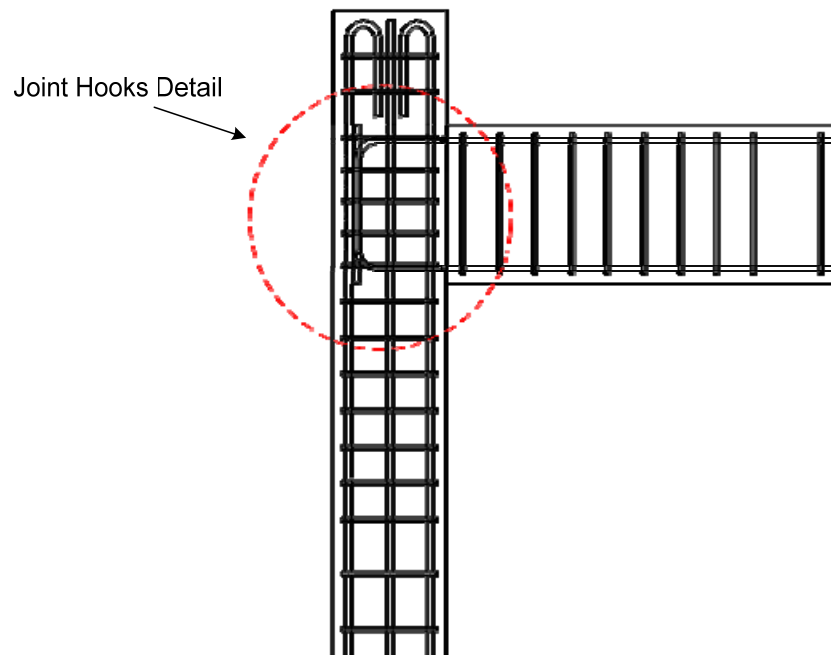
Beam Longitudinal Reinforcement Hooks used in the Test Specimens
